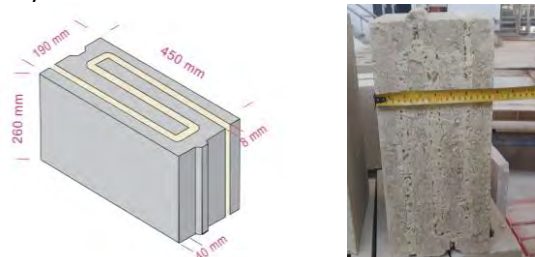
a) The DCB geometry: overall dimension of the multi-layered block; b) the manufactured DCB prototype.
